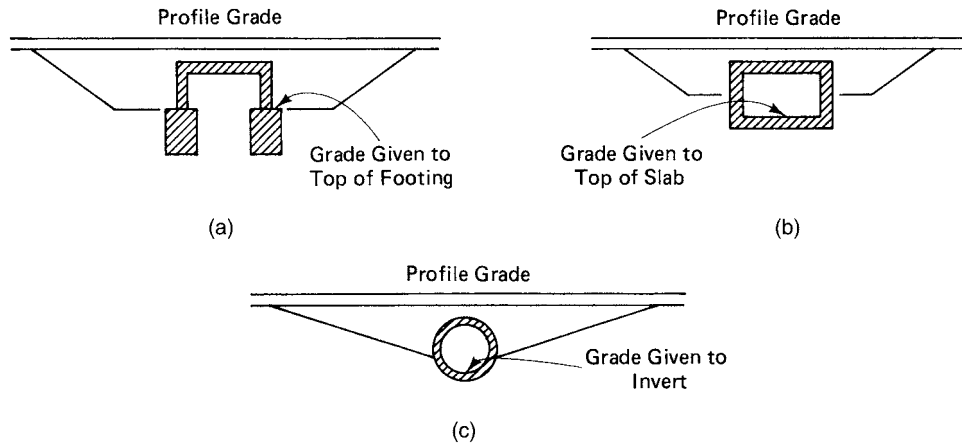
Types of culverts. (a) Open footing culvert. (b) Concrete box culvert. (c) Circular, arch, etc., culvert.
